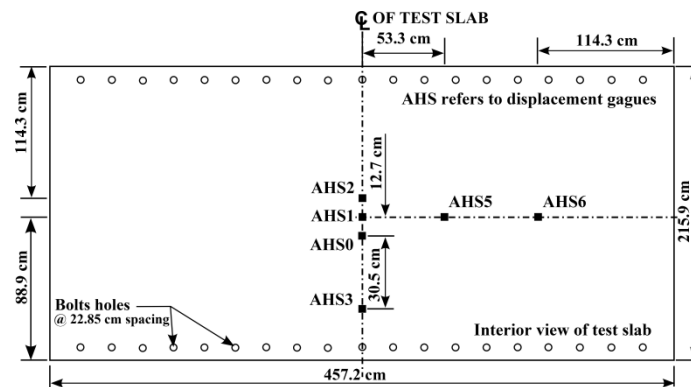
Instrumentation plan of test slab (Hayes, 1989).
